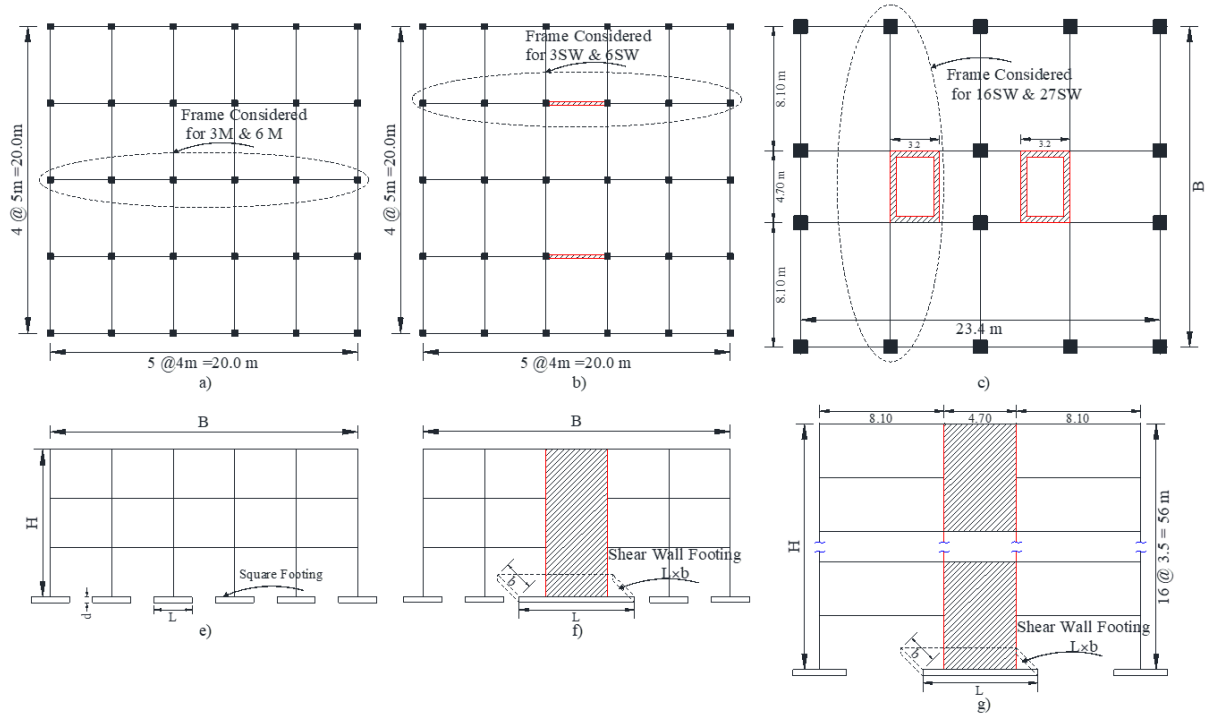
Building Plane and Elevation, a) planes of 3M,6M, and 9M buildings, b) plan of 3SW and 6SW buildings, c) plan of 16SW and 27SW buildings, e) elevation of 3M, f) elevation 3 SW, g) elevation 16SW
